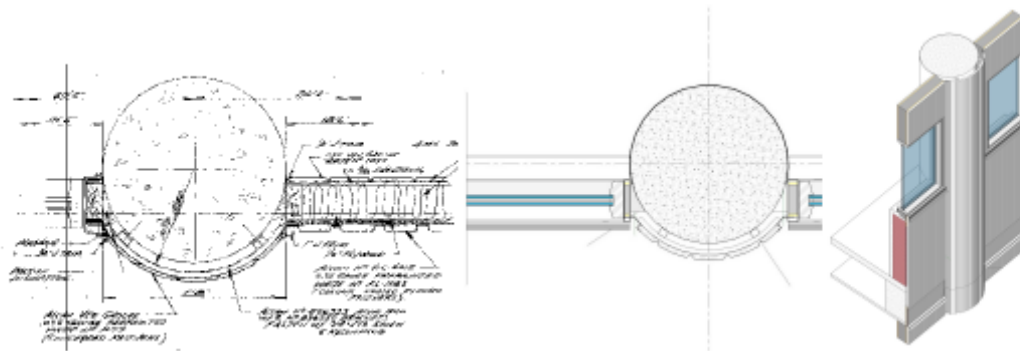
Original drawing plan (left) and reconstruction in Revit (right) (Fai et al., 2011).
